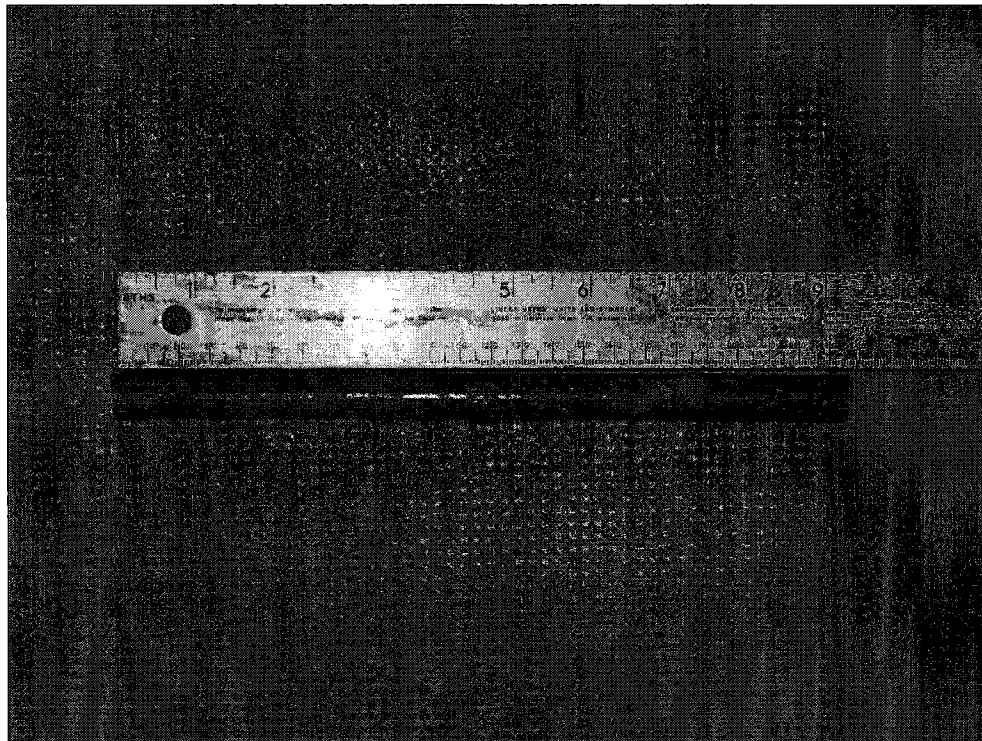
Rebar Sample S2 (West Abutment, 15M, vertical)
